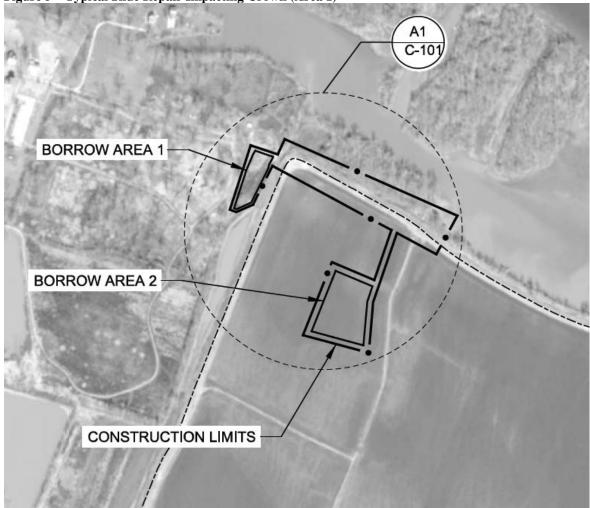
Area 1: Embankment slide repair construction and borrow limits.
